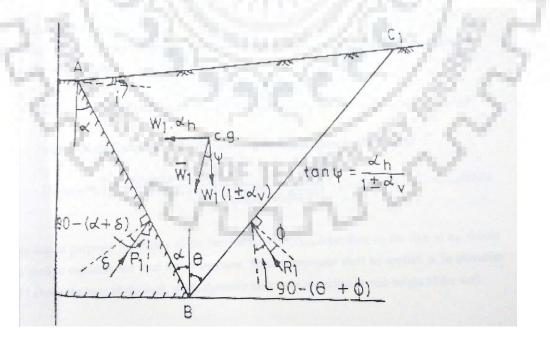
Forces acting on failure wedge in active state [Kramer (1996)]
